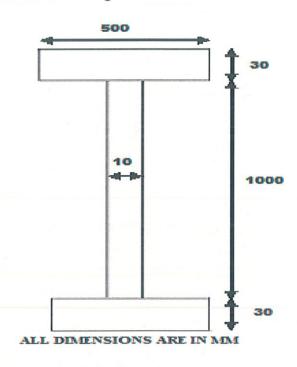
CROSS-SECTION OF PLATE GIRDER
